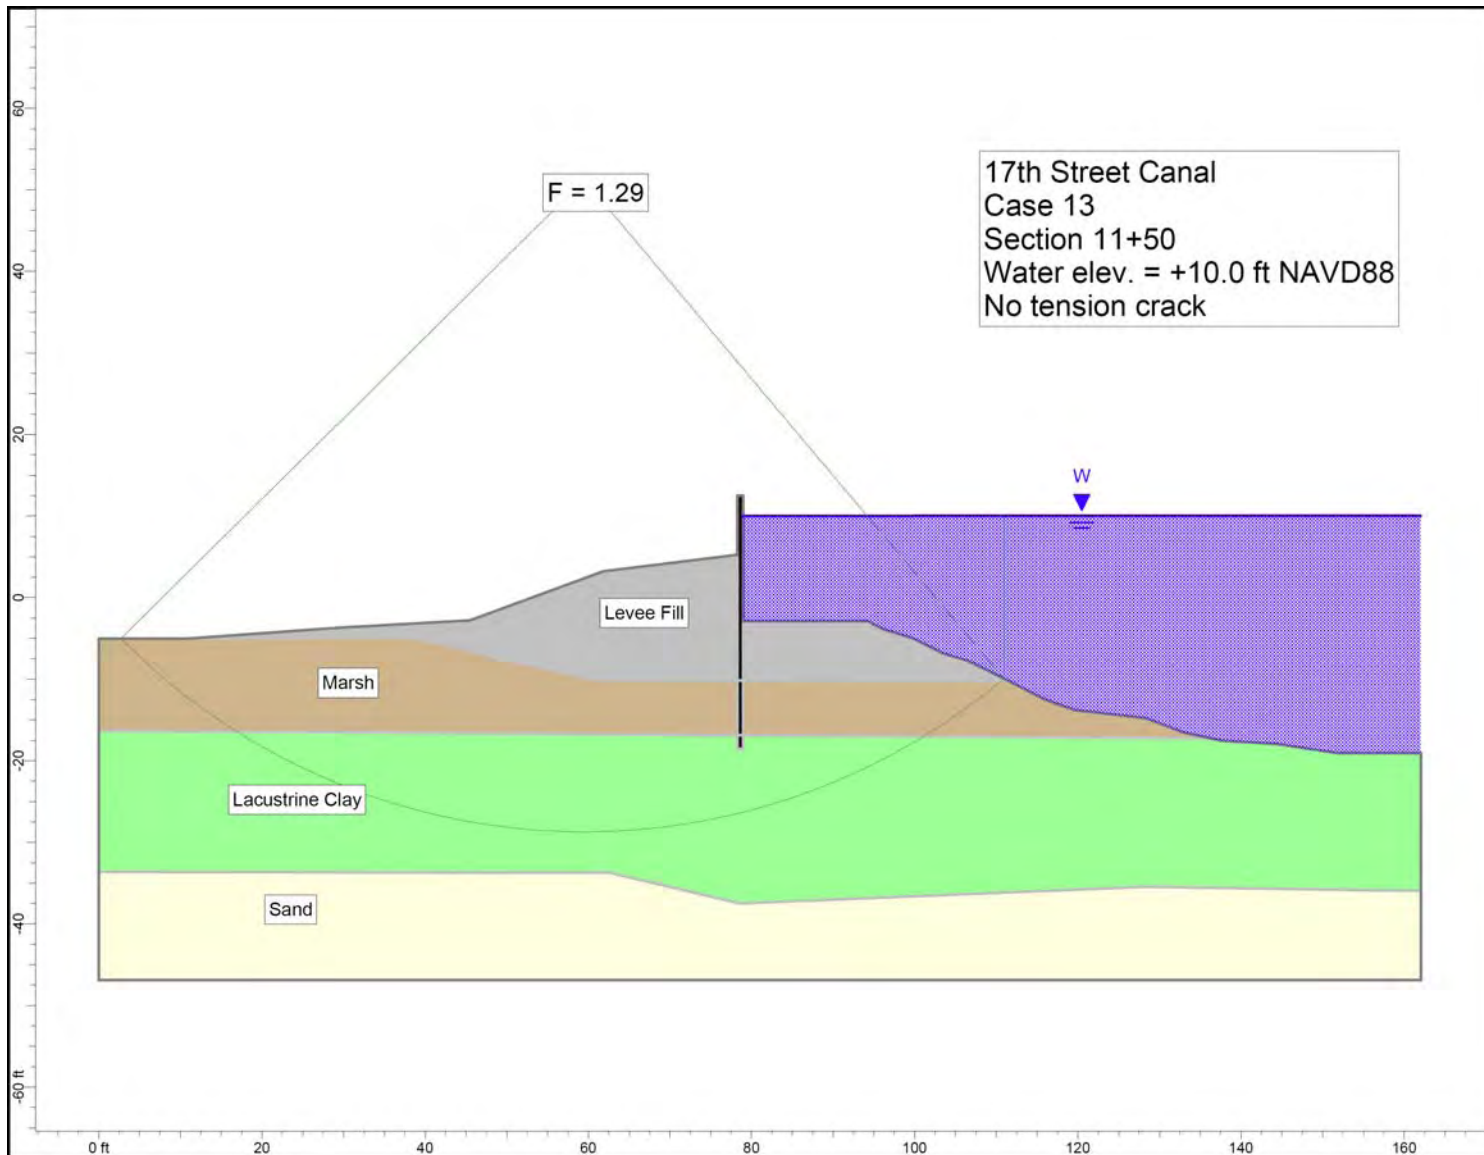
Critical Circle for 17th Street Canal Station 11+50 – Water Elevation 10 ft, No Tension Crack
